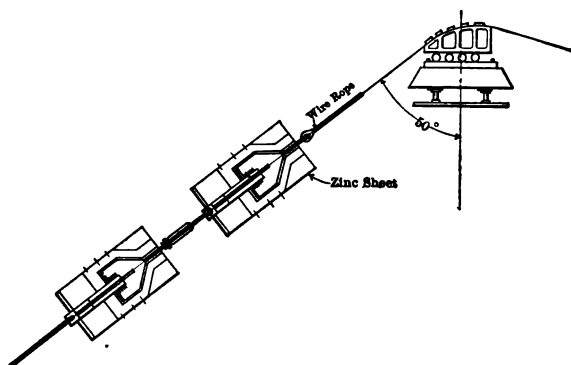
METHOD OF ANCHORING WIRE CABLE SPAN.
